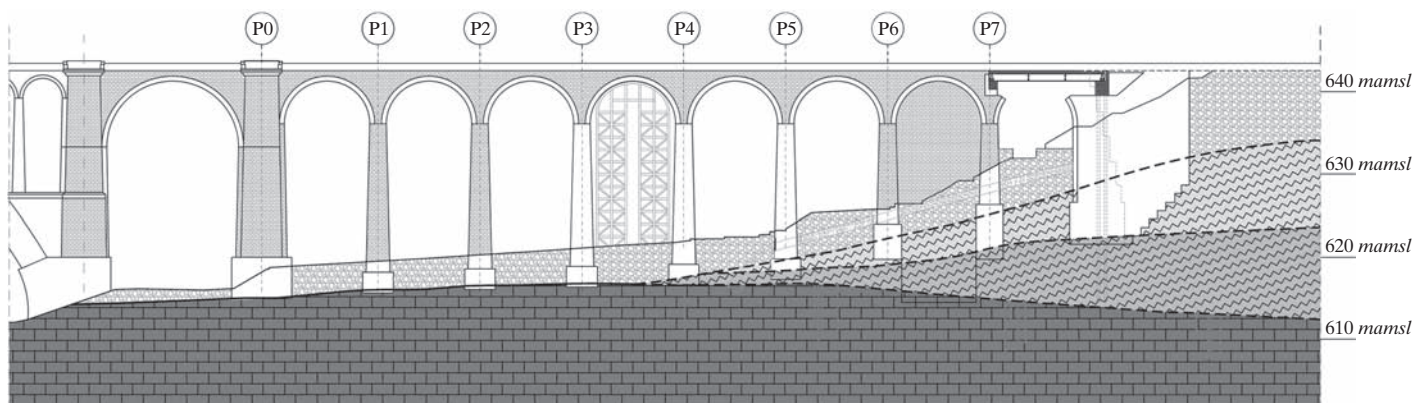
Geological section of the right side of the Sidi Rached bridge
